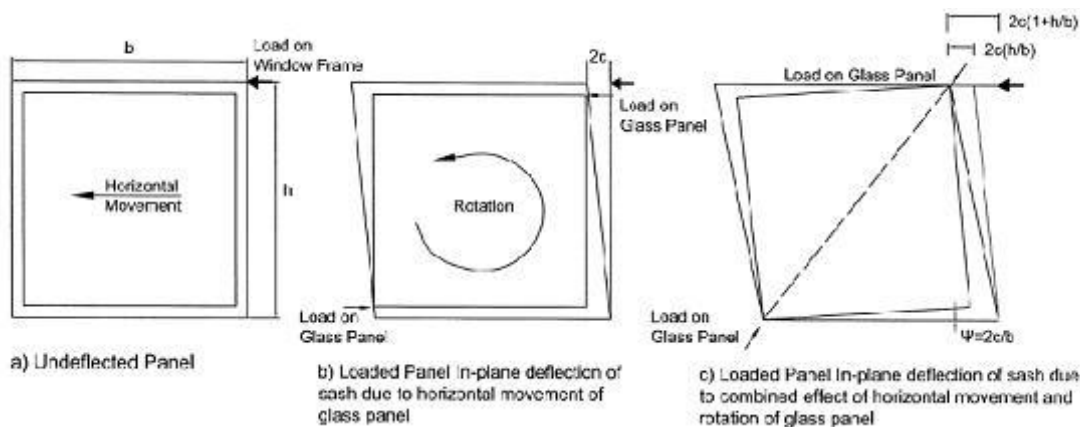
In-plane movement of window panel subjected to lateral loading
